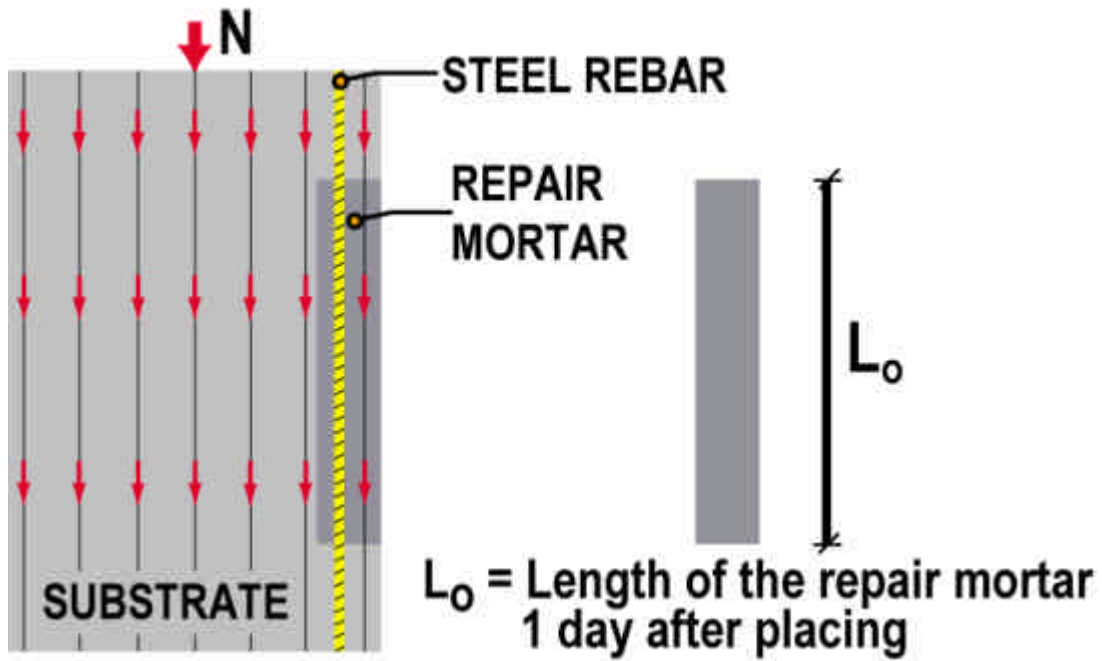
Repair work affects a portion of the column. One day after placing the hardened repair mortar is exposed to a dry environment.
